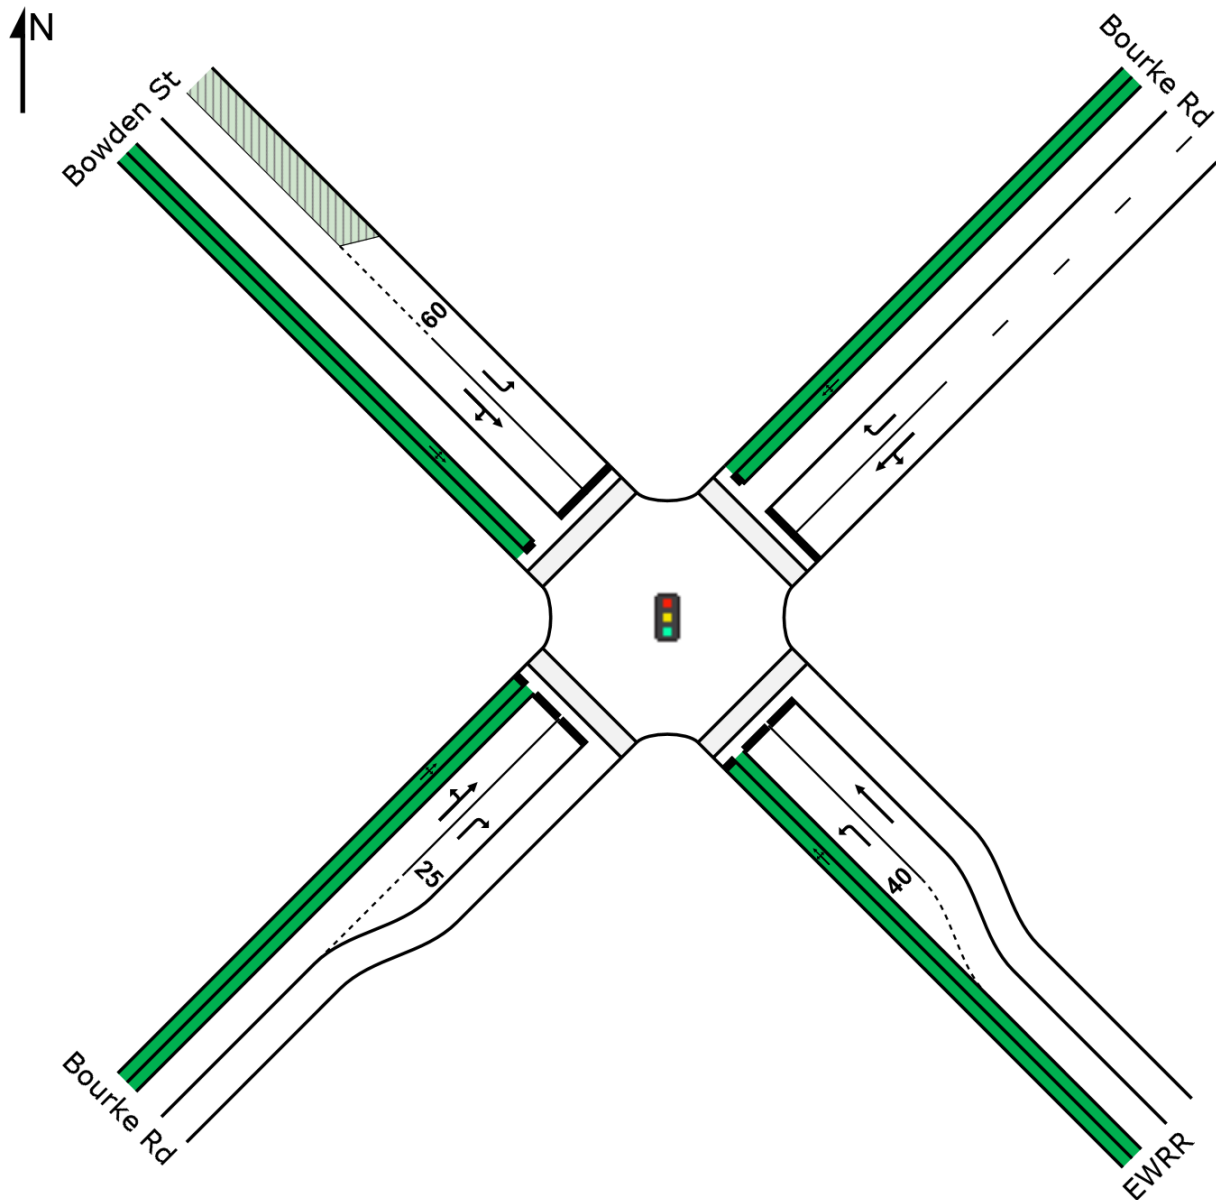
Proposed Intersection of Bourke Road | GS2AC | Bowden Street
